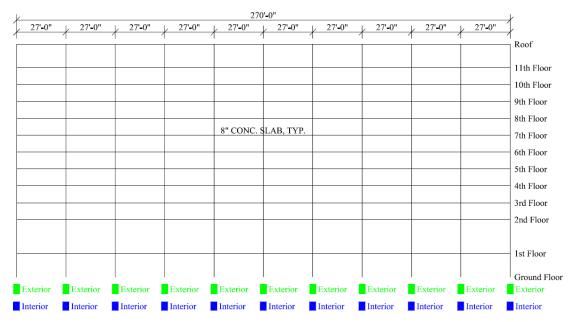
Typical frame resisting lateral loads in E/W direction (See column legend for sizes)
